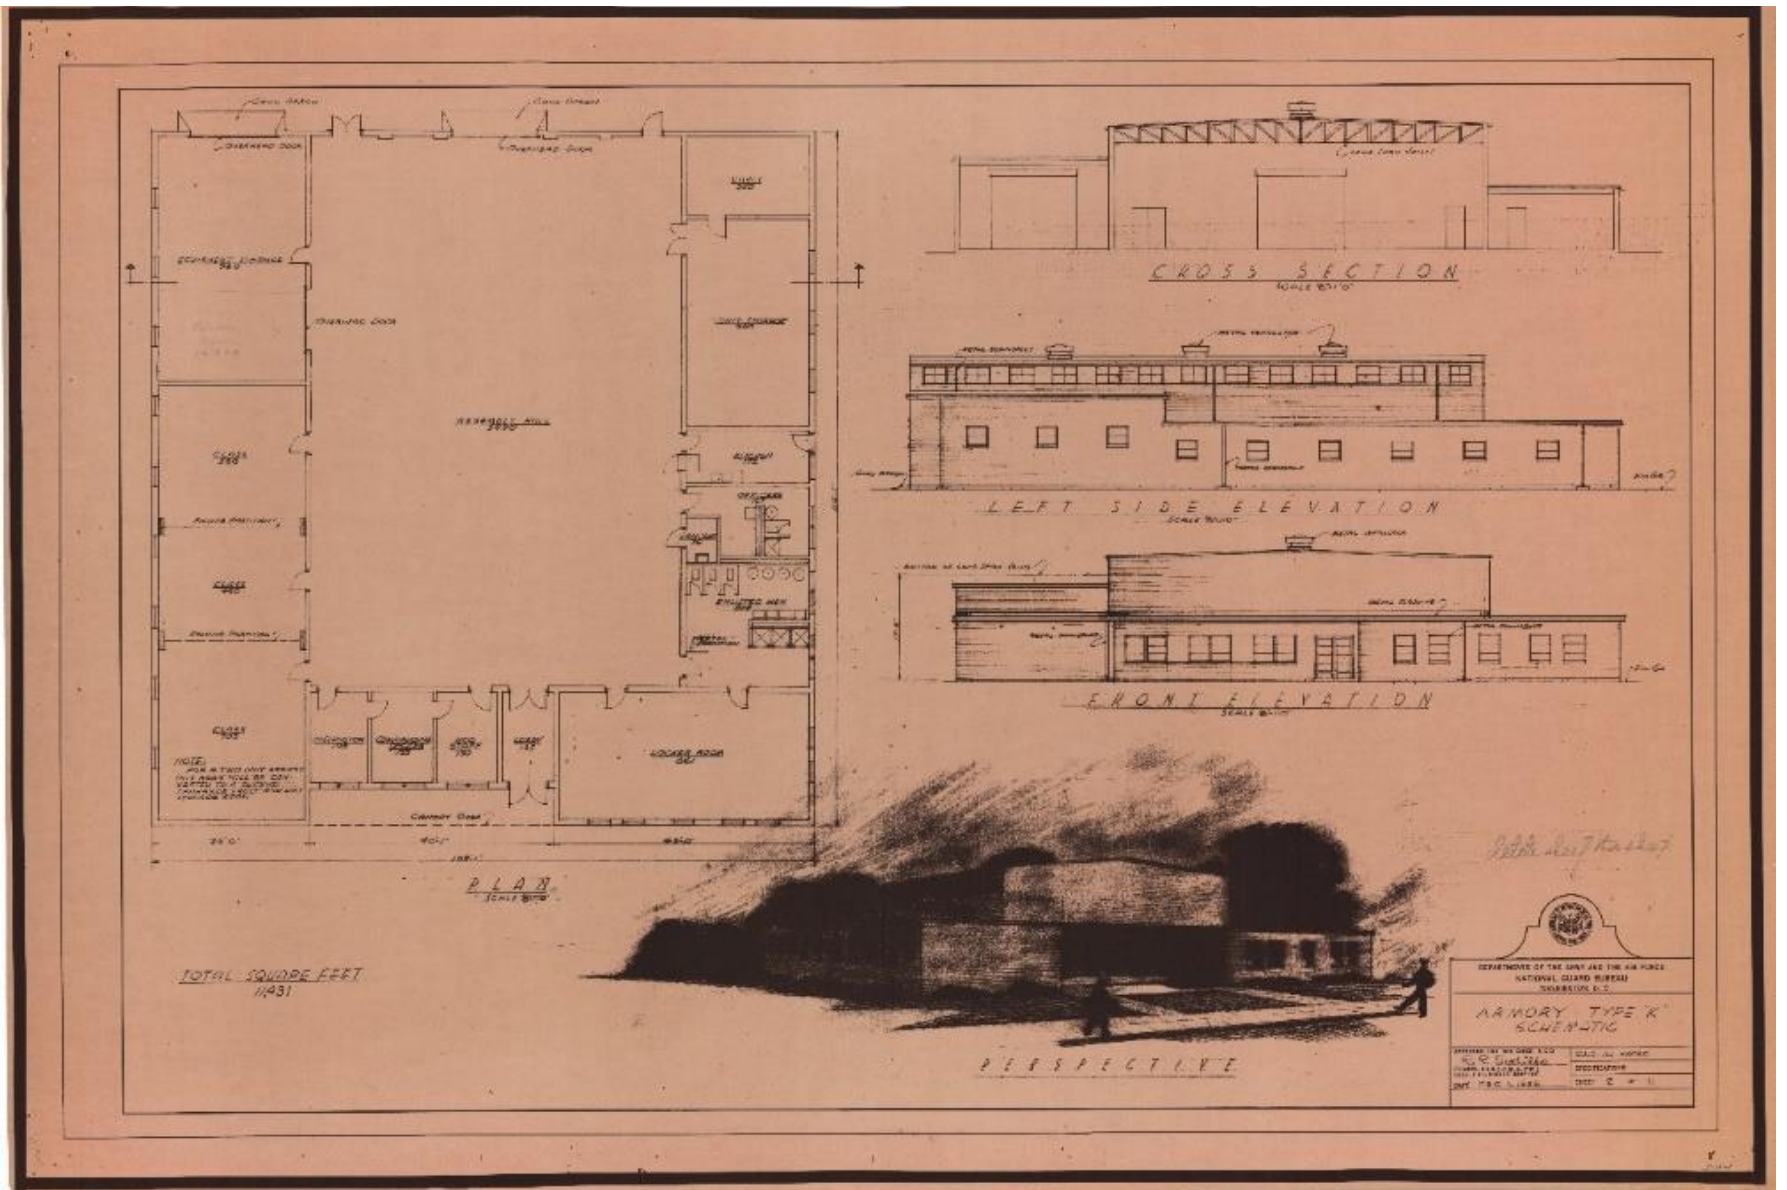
Type-K plan, perspective, elevations, and cross section, 1952 (OMD archives).
